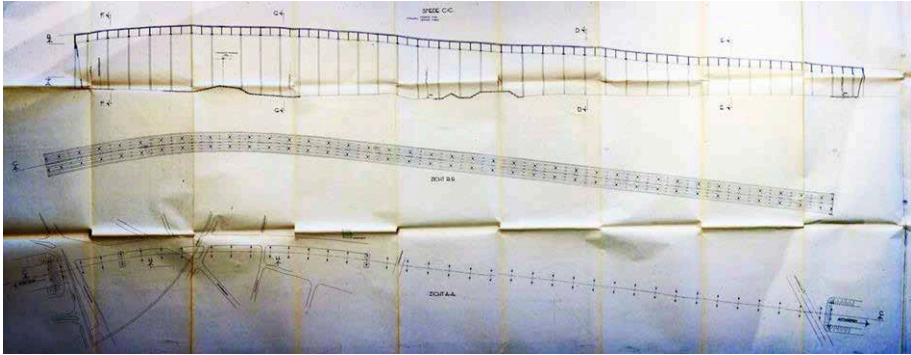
Preliminary plan of E3 route, including a tunnel east of the Brusselsesteenweg, 1963 (Source: City Archives Ghent “Zwarte Doos”, GAGB series, nr. 461, Belgian Highway Division, Preliminary plan on Gentbrugge territory, March 1963) (in: Druwé & Lalush, 2011)
